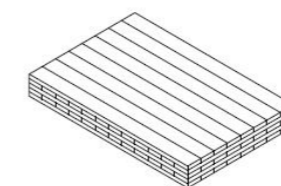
Kaufmann, Krötsch, and Winter (2018) Beam floor
